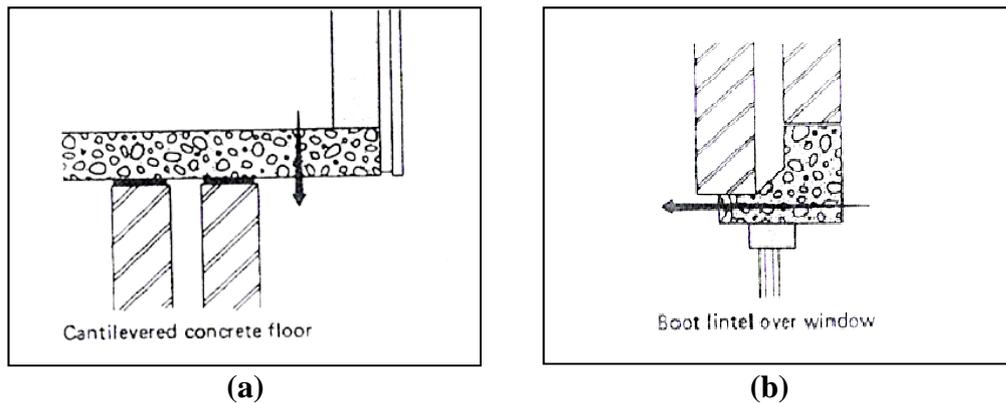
Thermal bridges a. At cantilevered concrete floor b. At boot lintel over window (Source; McMullan, 1998, p. 46)
